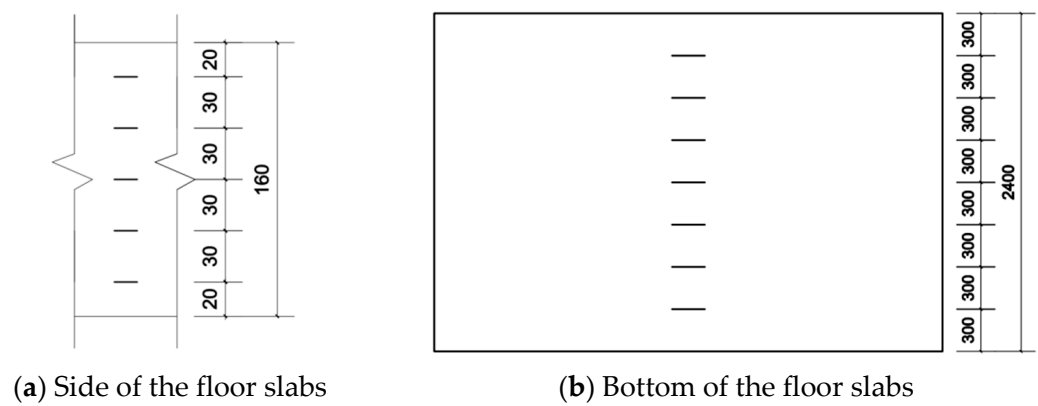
Layout of measuring points of concrete strain gauge (unit: mm).
